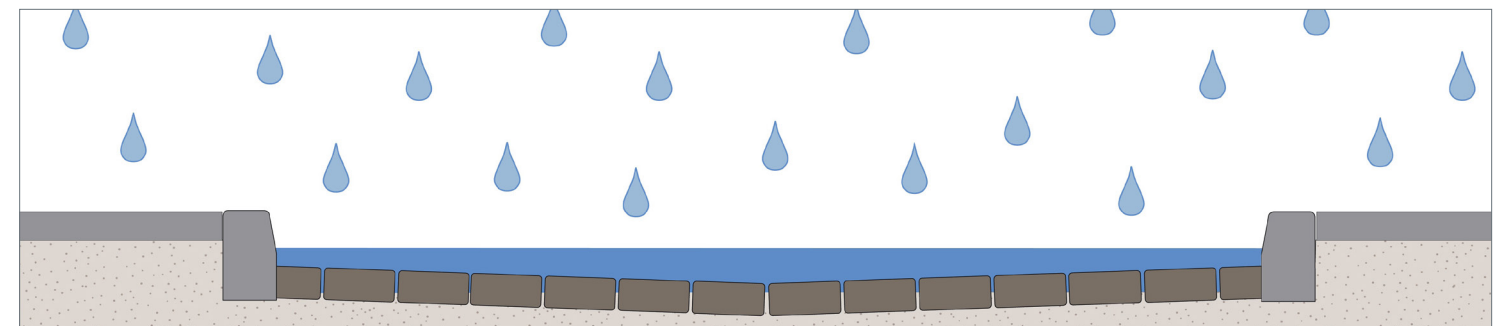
IMAGE CREDIT: Hollow Road | Amsterdam Rainproof
